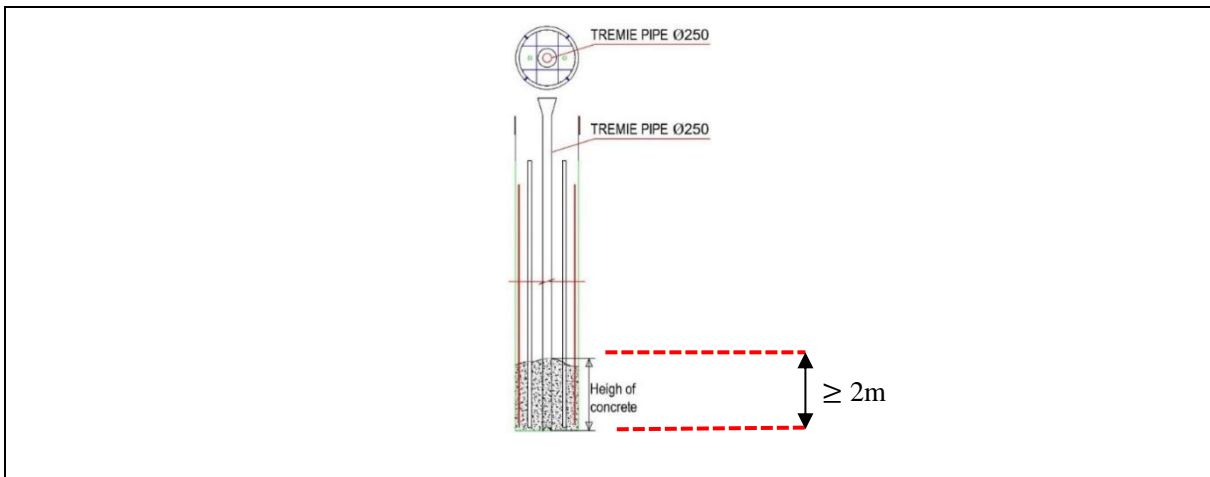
Tremie Pipe 2 m Buried to Concrete
